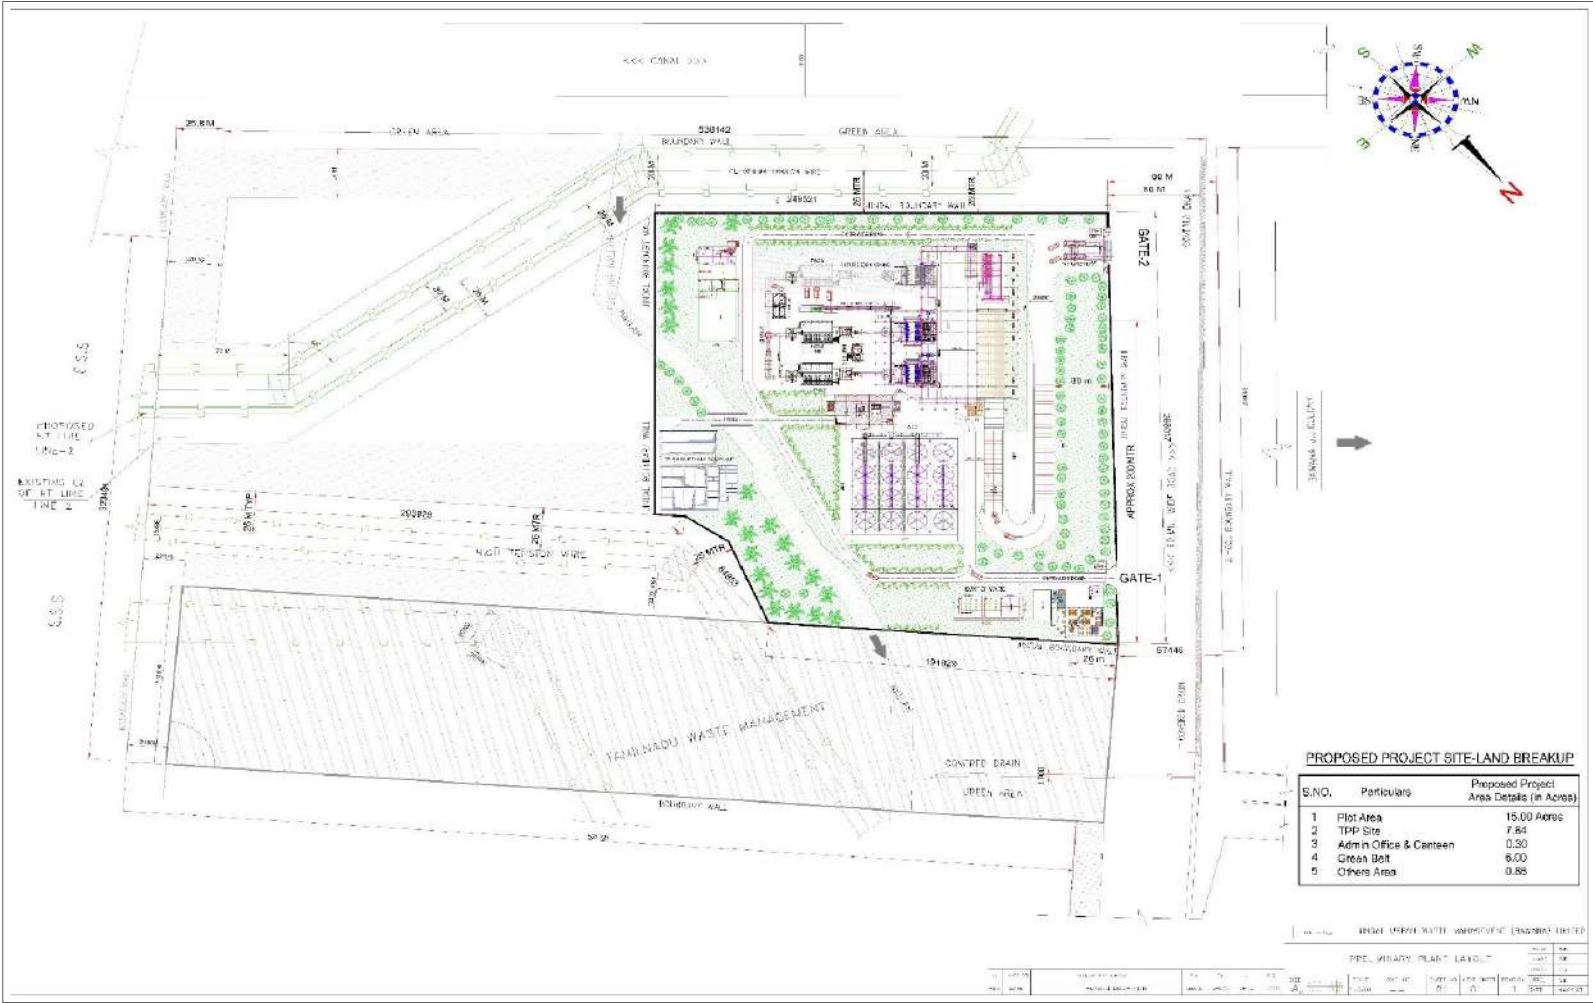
Project Layout plan for Waste to Energy Plant, Bawana
